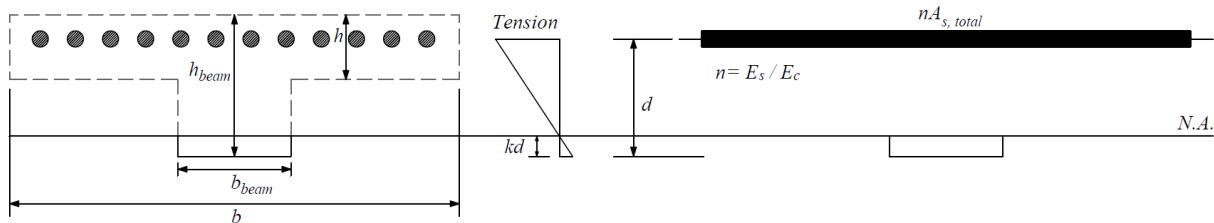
Cracked Transformed Section (interior negative moment section for end span)
